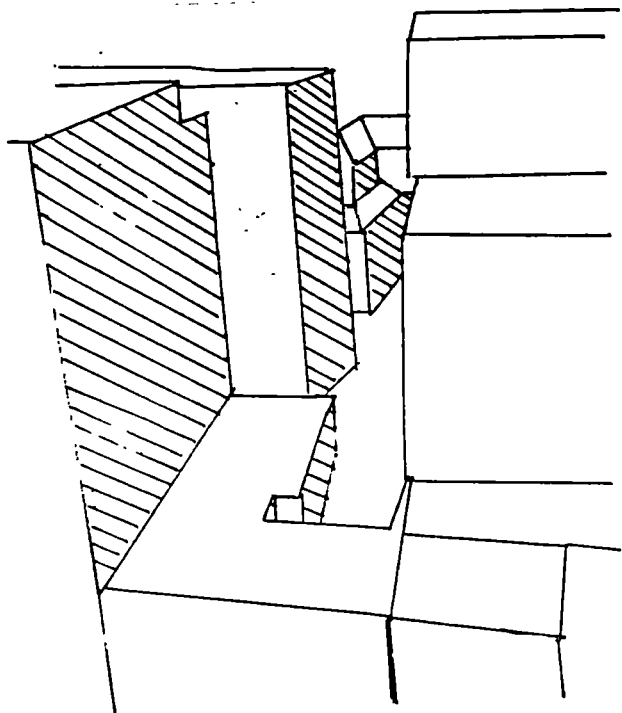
Taller buildings surrounding Trafalgar Place create a sense of enclosure
